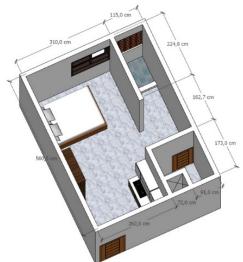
Floor Plan Family Type Residential Plan Blocks
